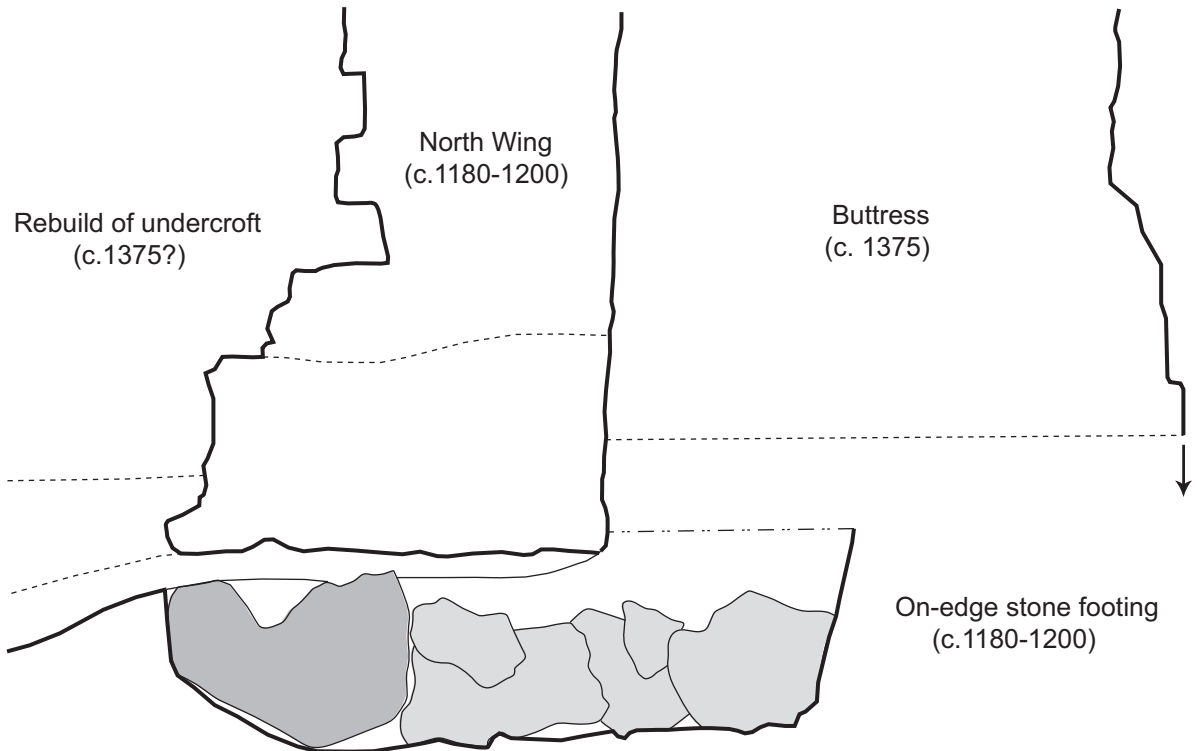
Northwest facing elevation of north wing showing original build plus later additions.
